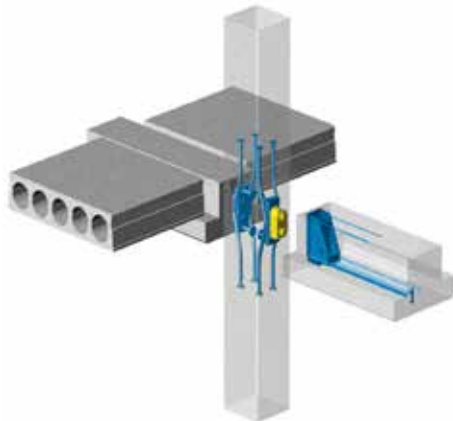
Solution for connecting a column to a beam from Peikko on hidden brackets
